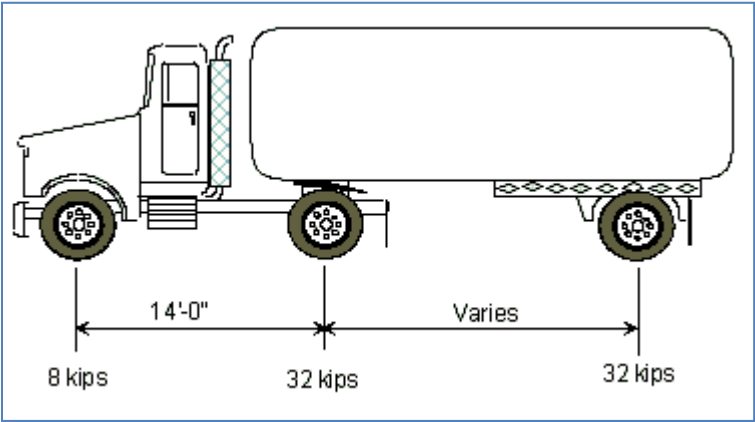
HL-93 and HS-20 36 ton loading truck.
